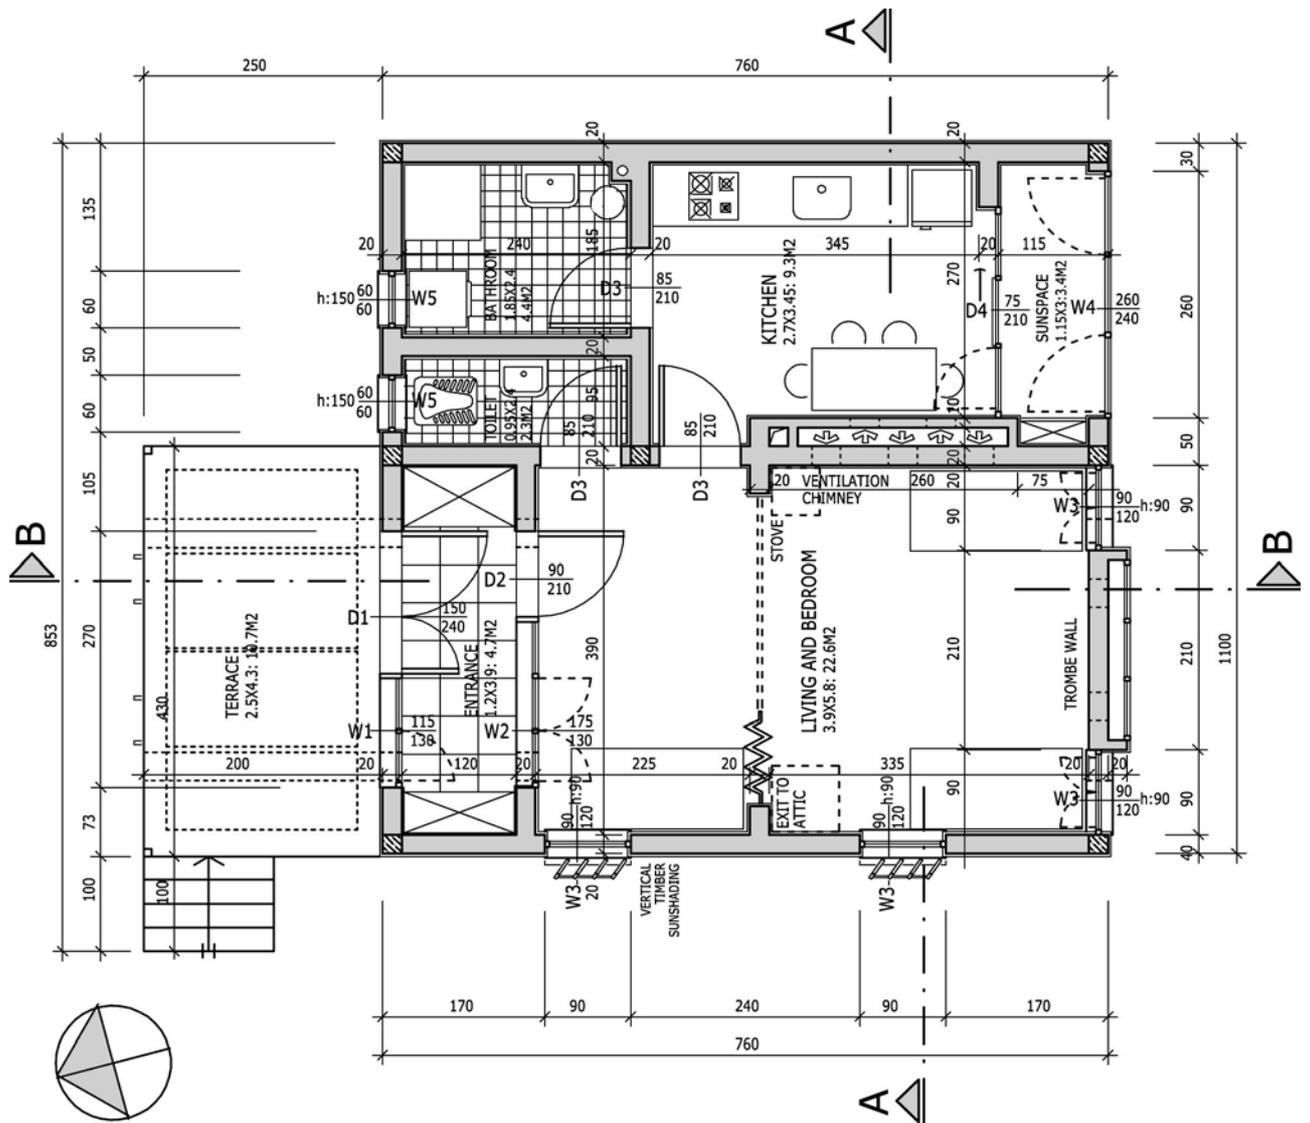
Plan of type D₁ dwelling: first phase in the construction process before the addition of bedrooms; Scale 1/80
